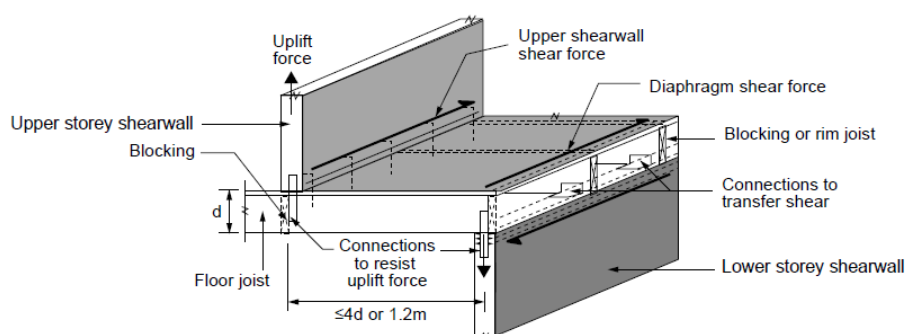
Extract CWC EGWFC Figure 10.1.5 Shear wall elevation offset force transfer
